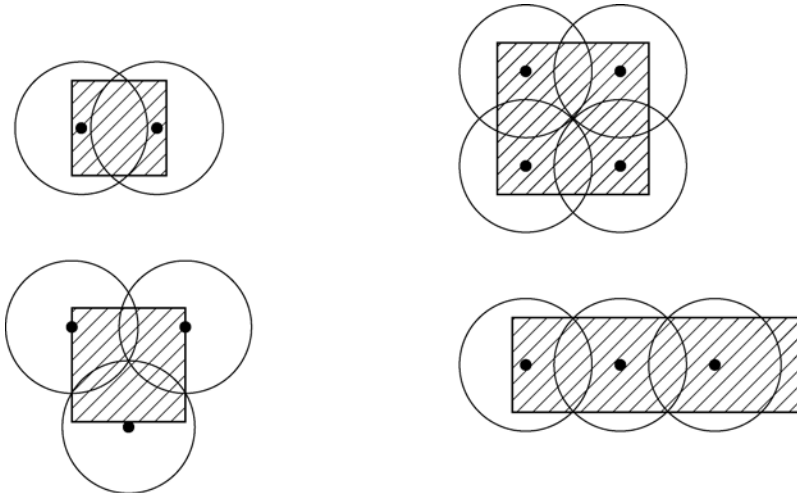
Typical arrangements of compaction probes below isolated and strip footings
